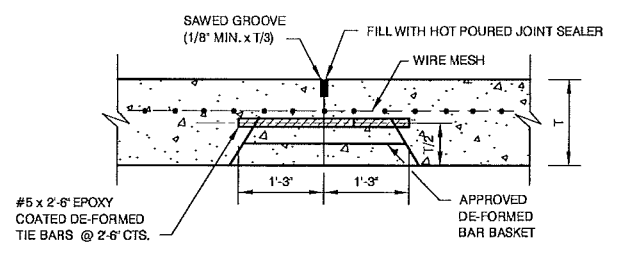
DETAIL OF  $\parallel$  LONGITUDINAL JOINT WITH EPOXY COATED TIE BARS
